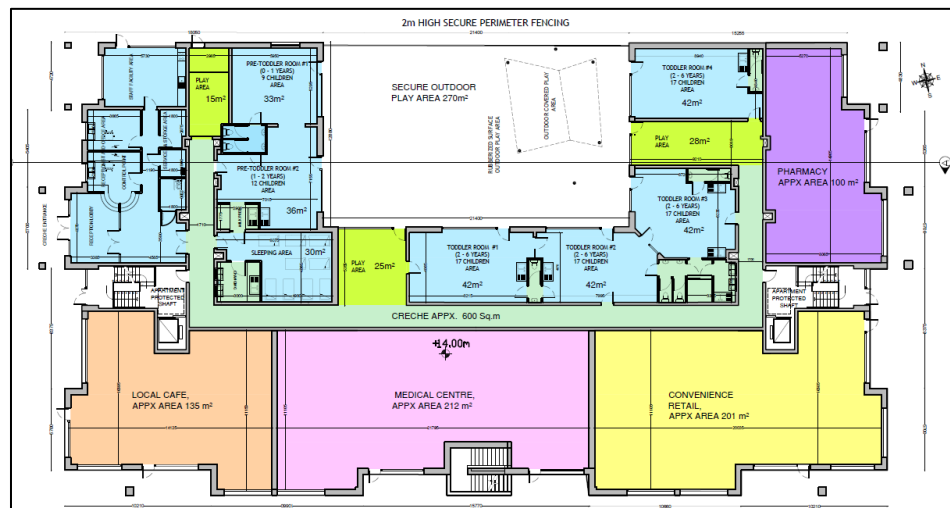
Proposed Neighbourhood Centre Creche and Commercial Ground Floor Plan
